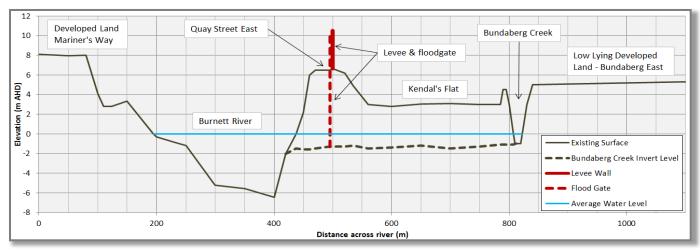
(above): Cross-section of the proposed East Levee and Floodgate
